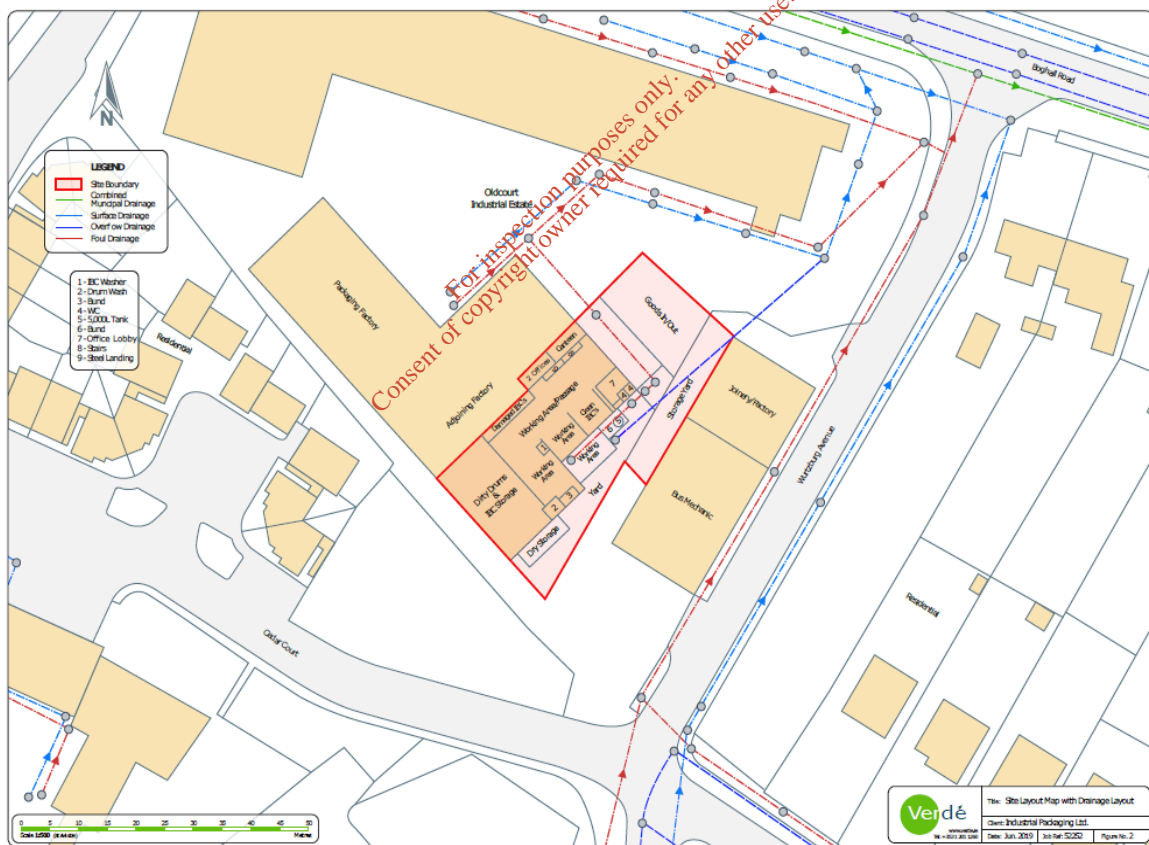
Site Layout – Overview of site layout with areas of work and drainage network illustrated.
